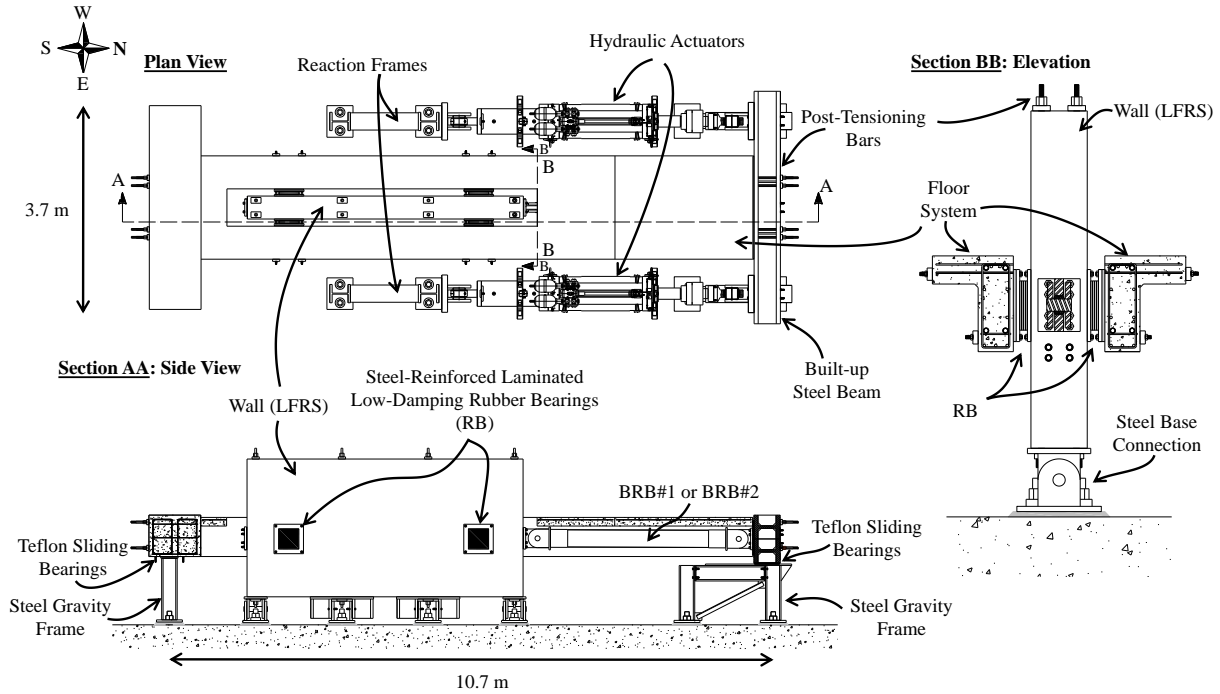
Plan view, Section AA, and Section BB of experimental set-up.
